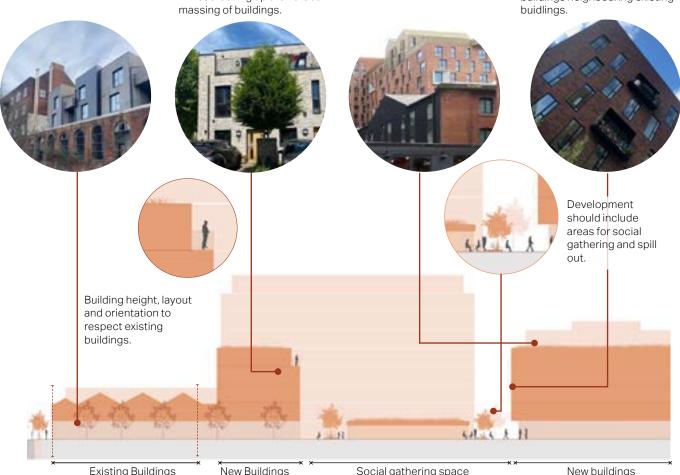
Illustrative section demonstrating transitional stepping of building heights, articulation and variation at upper and ground floors..
